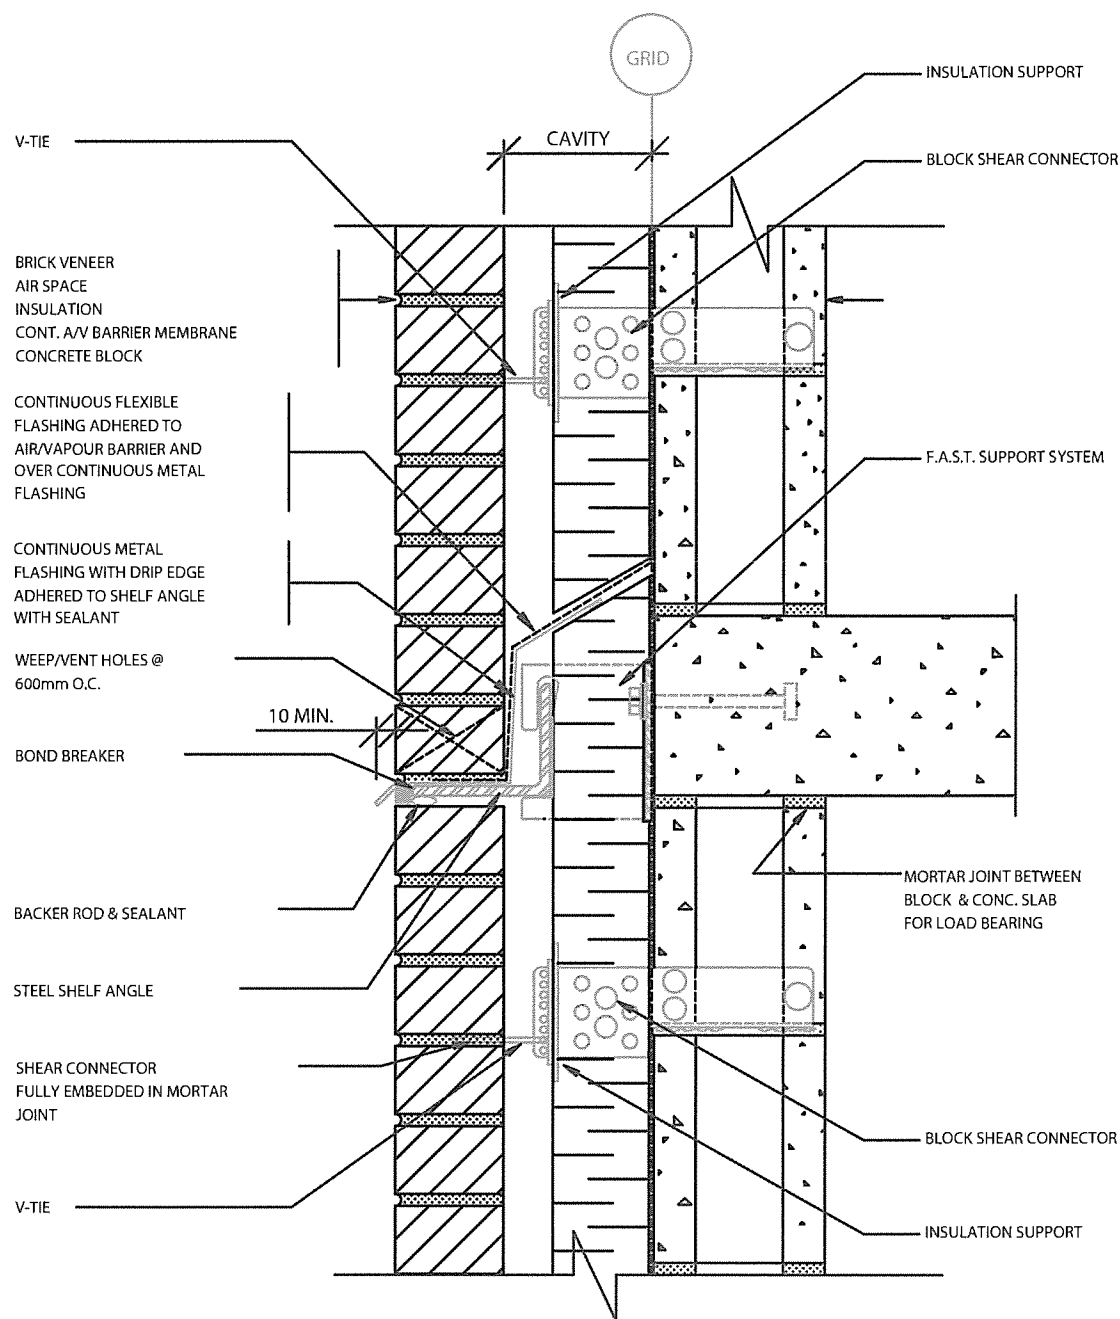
BRICK VENEER/CONCRETE BLOCK DETAIL AT SLAB EDGE
